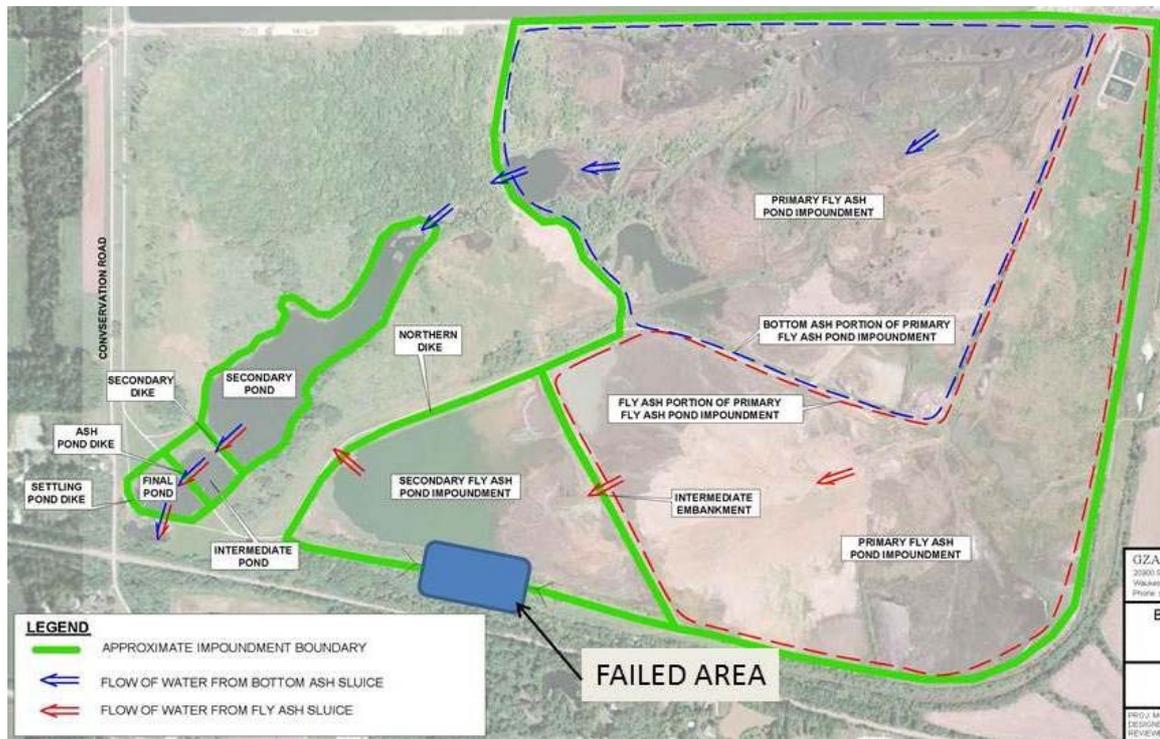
Baldwin Facility Site Plan³, with highlights by the authors
